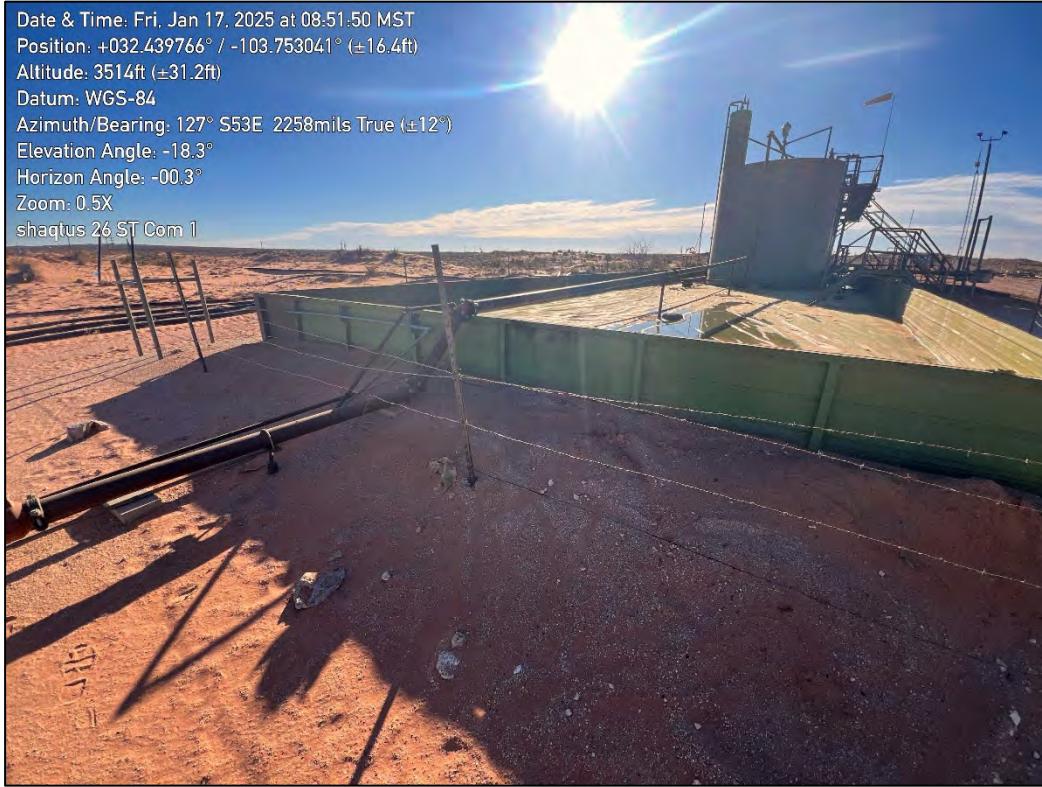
Southeastern view outside of containment during liner inspection activities. 1/17/2025
